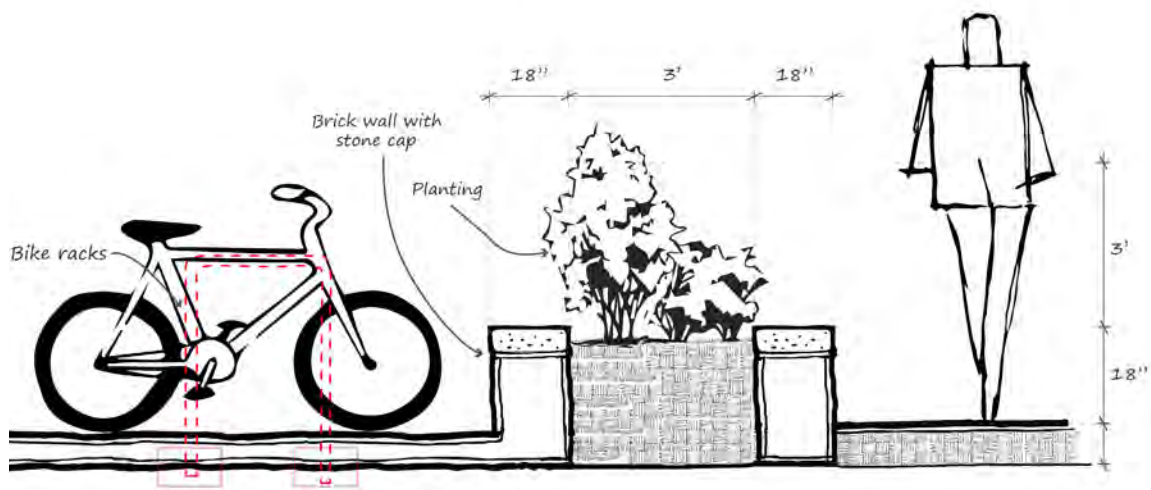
Conceptual design for low brick wall with stone cap & planting
